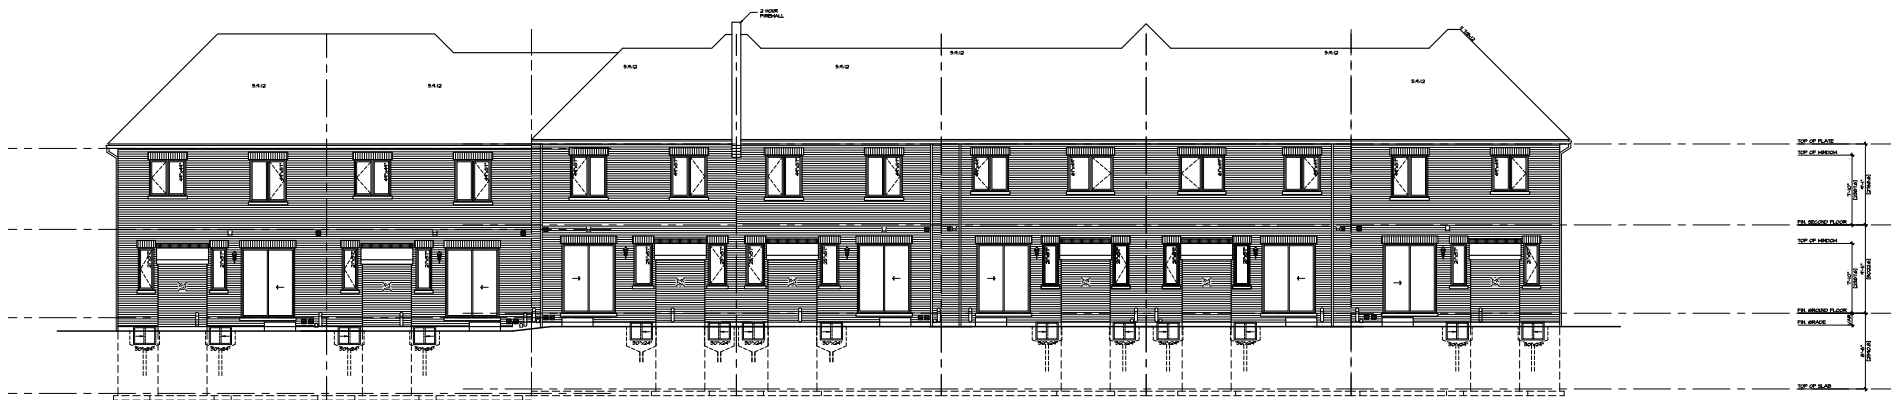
Front-Loaded Townhouse Rear Elevation
